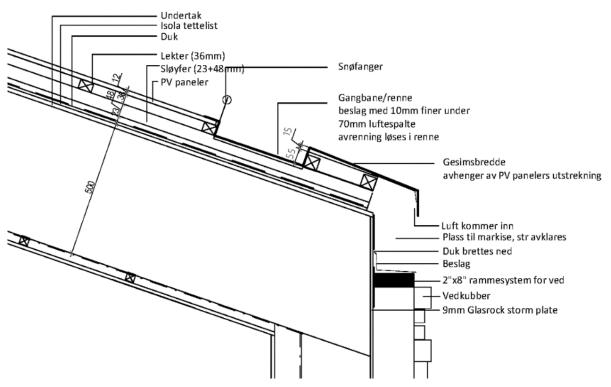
The transition from the atrium wall to the roof (eaves). Source: Snøhetta.
